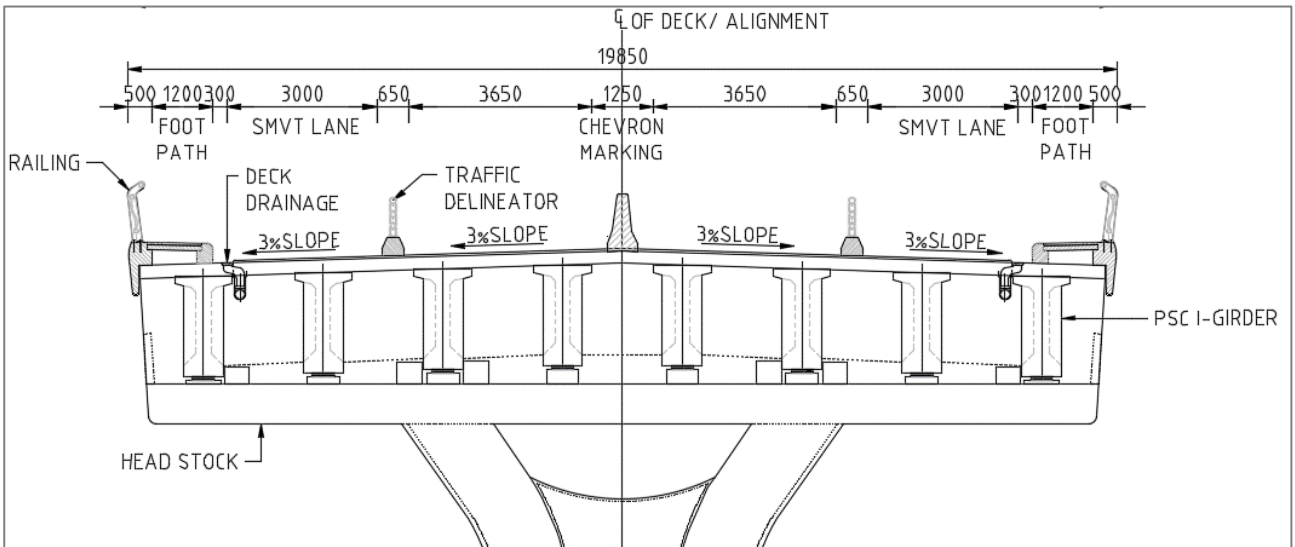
Cross Section of PSC I-Girder Type Viaduct/ Elevated Road
